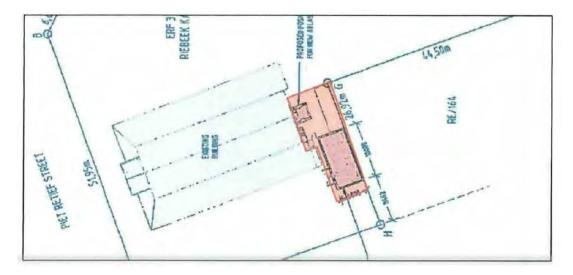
Excerpt from the original lease diagram with the area shaded red being the proposed location for the consent use and applicable building line departure
